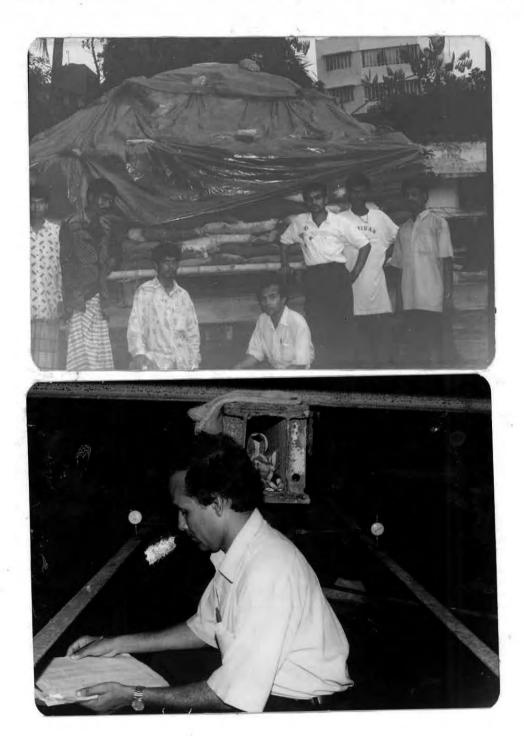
(D) Photographs of Pile Load Test at Moghbazar Site
